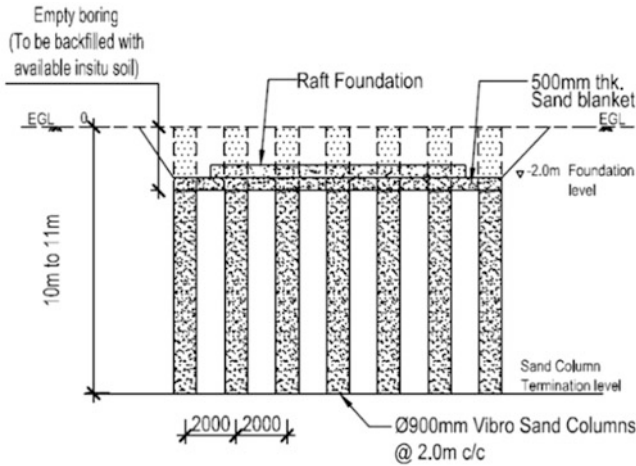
Sketch showing the typical arrangement of sand column below Raft
